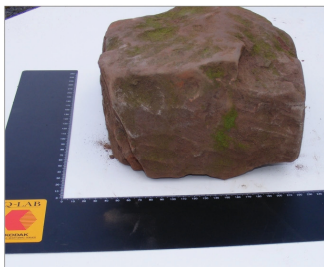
, Stone 10, shows rough tooling on this end of the block, this appears to have been done using a 2½" (6.5cm) bolster.
